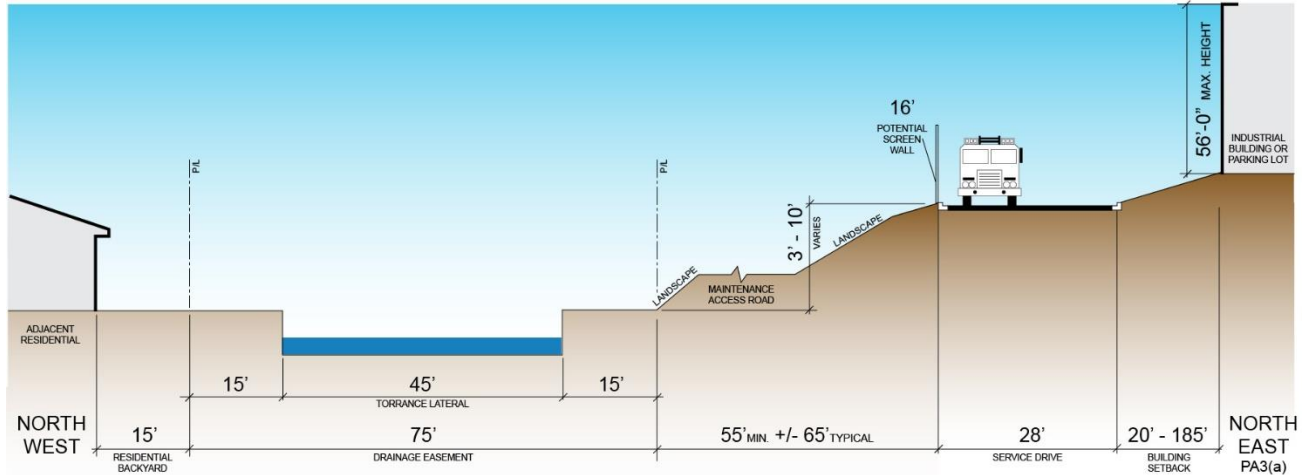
Section F – Freeway Edge (I-405 Freeway/Specific Plan Area Interface)
